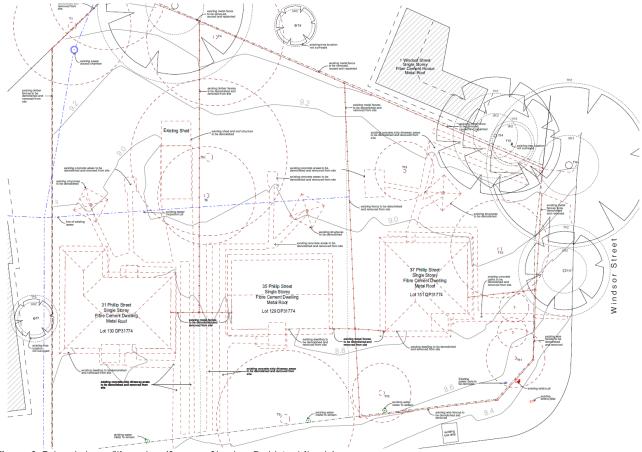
Extract demolition plan (Source: Stanton Dahl Architects).
